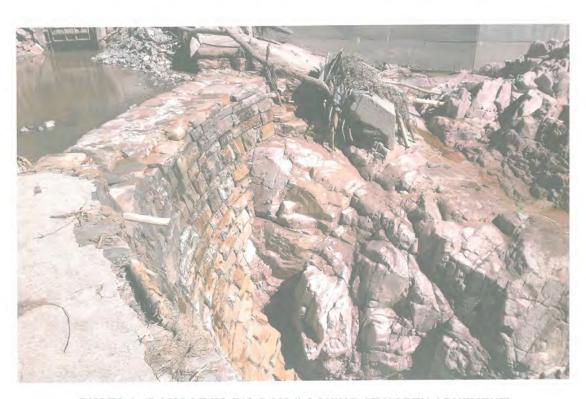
DAMAGE TO BIG DAM (LOOKING AT NORTH ABUTMENT)
